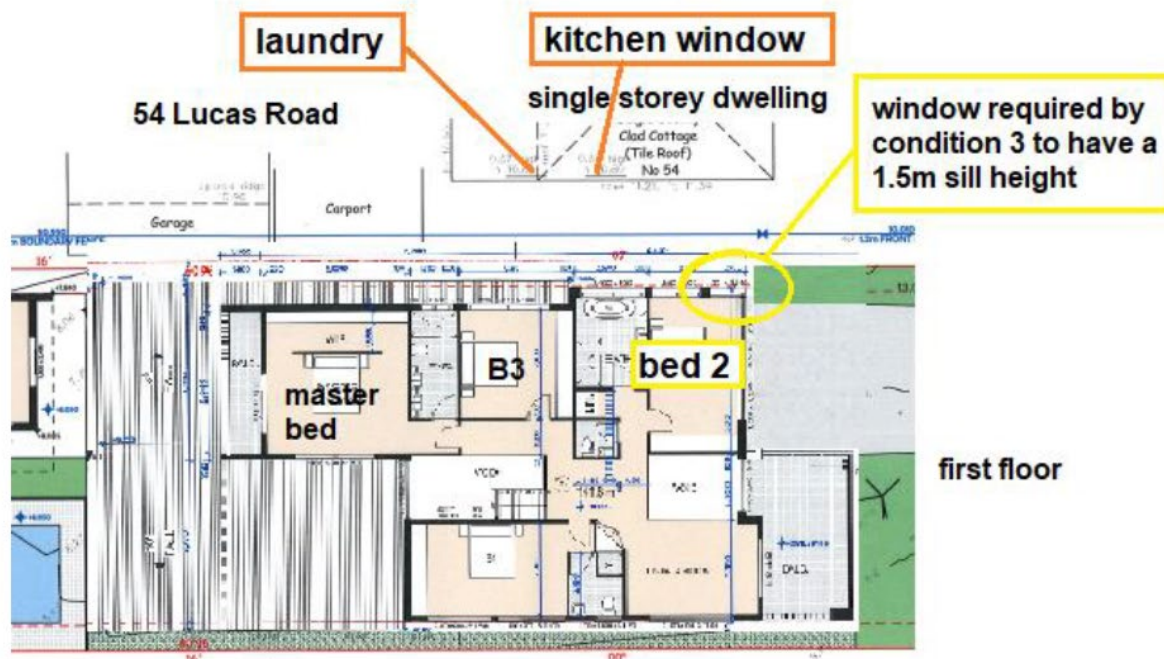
2nd Storey floor Plan and Relationship to Adjoining Dwelling at 54 Lucas Street Source: Applicant
